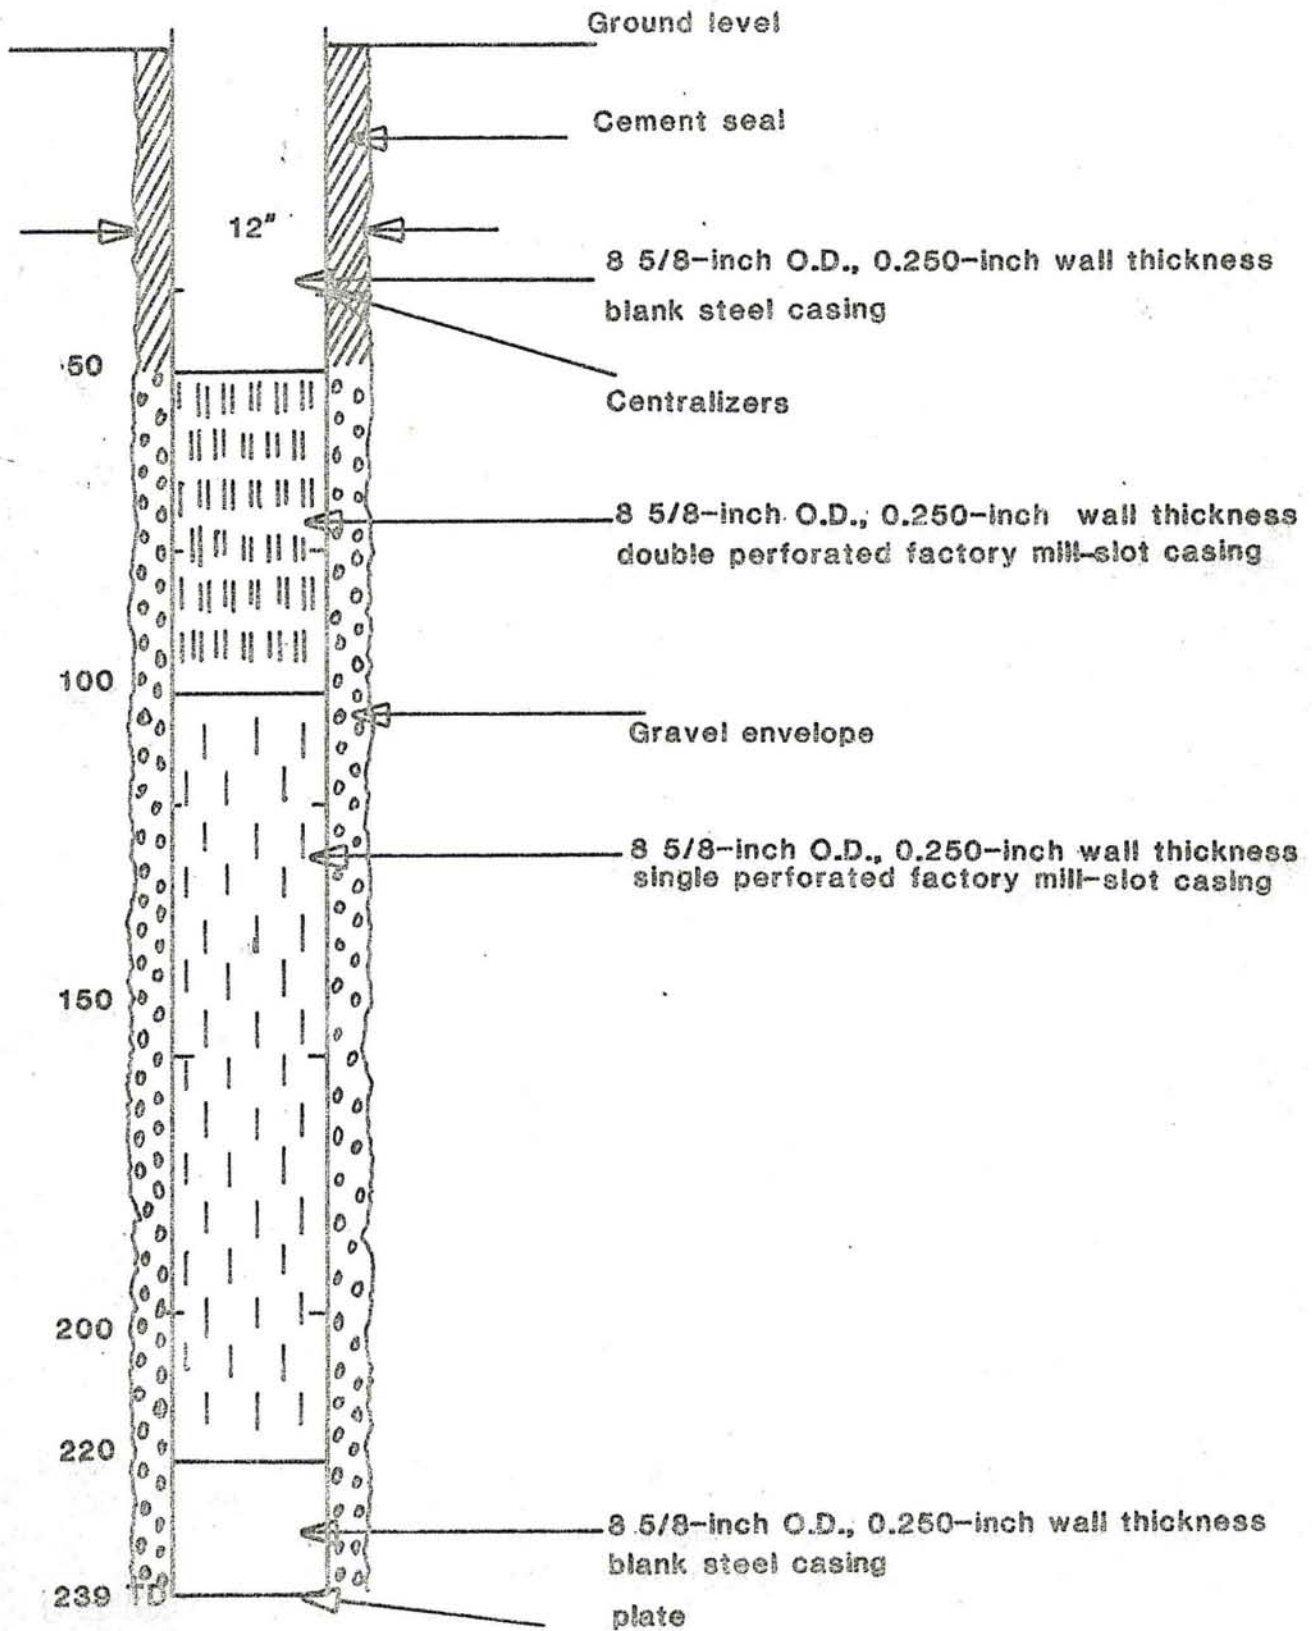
Elko Junior High School Geothermal Observation Well Construction Diagram.
